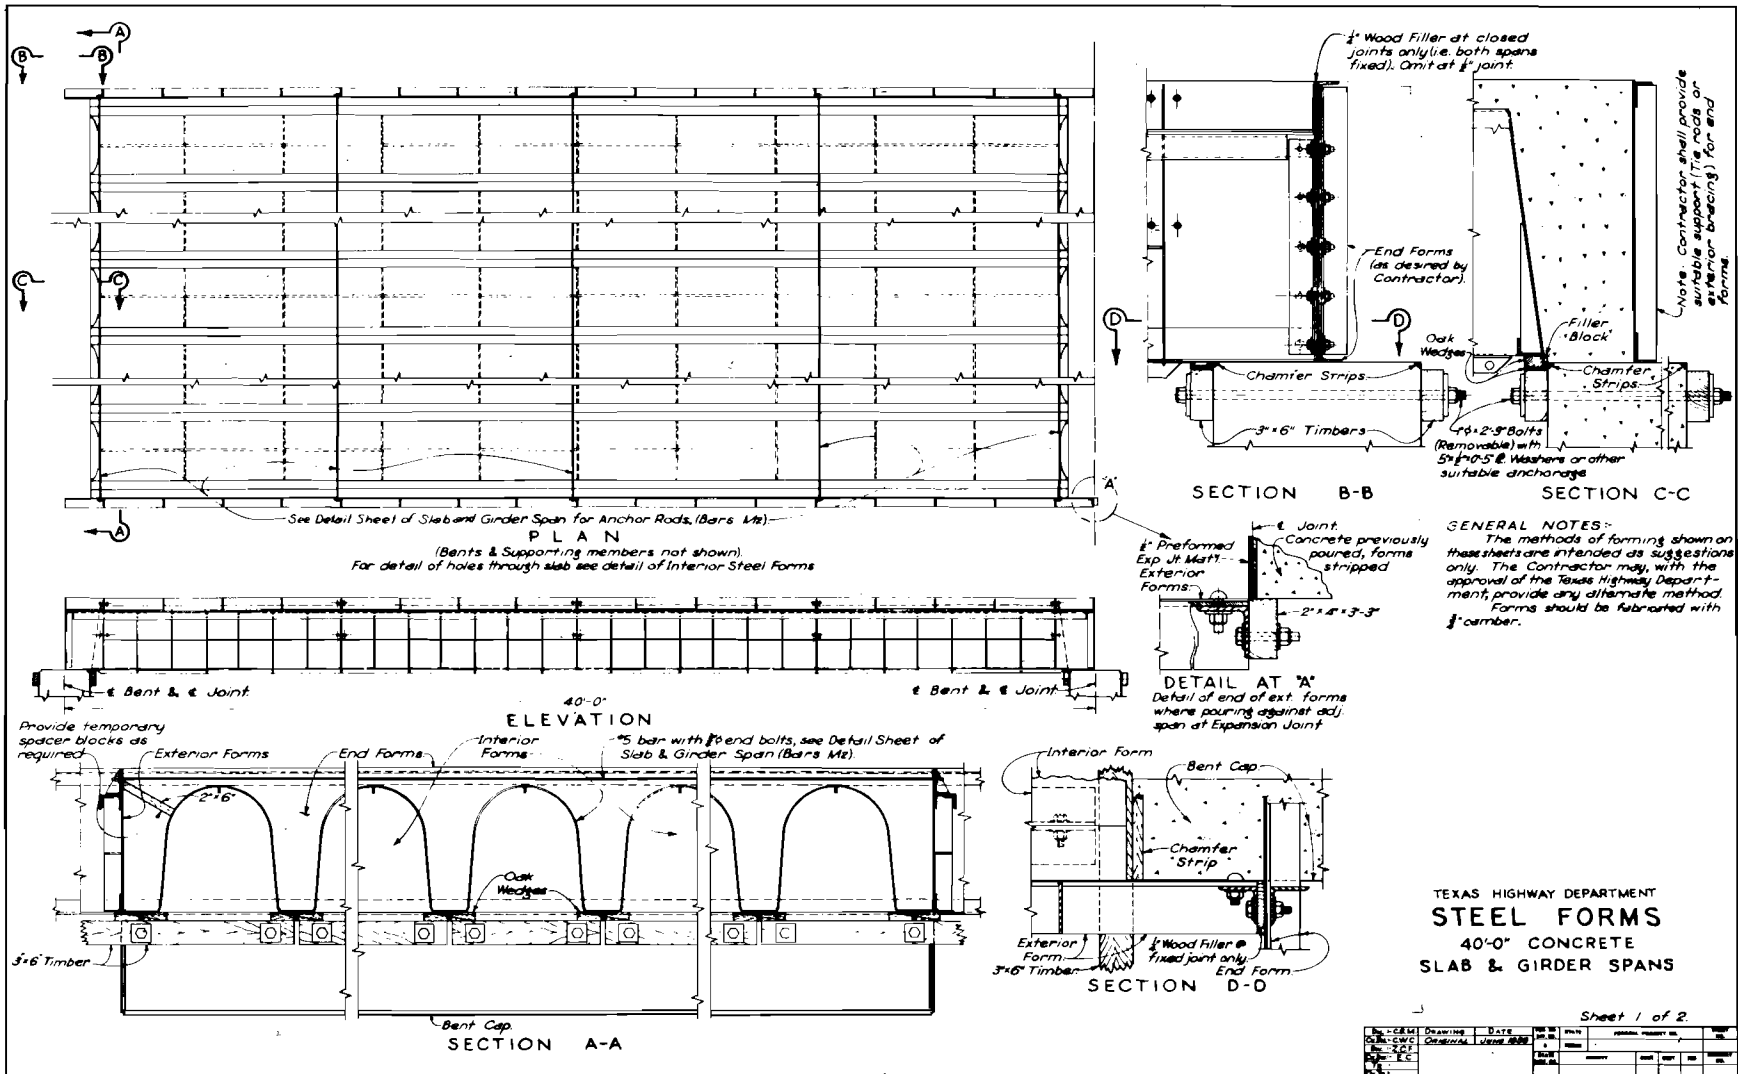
Steel Forms for 40'-0" Slab and Girder Spans, Sheet 1 of 2.
